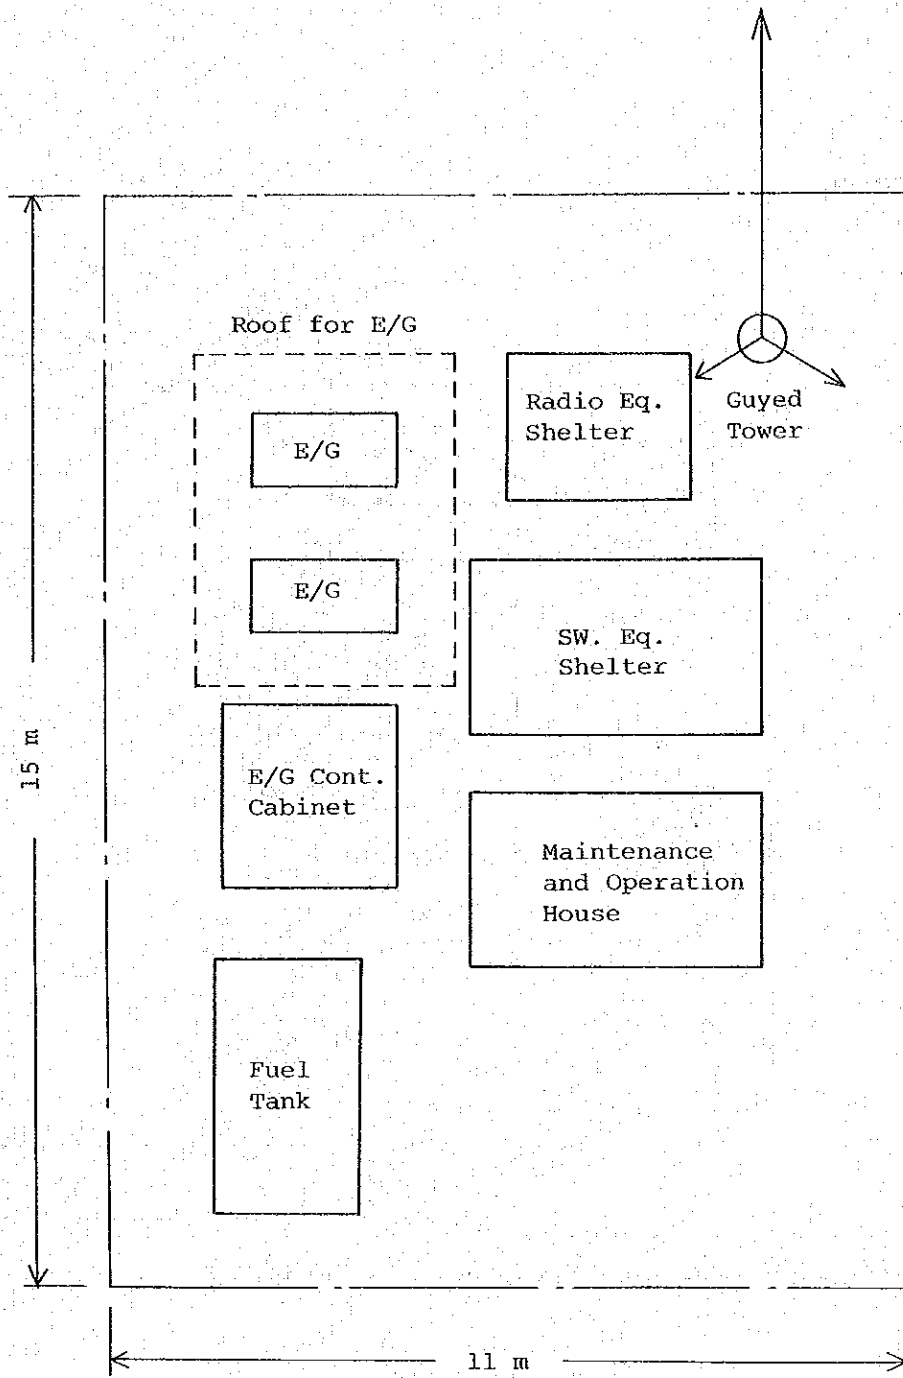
(4/5) Typical Site Layout Plan for Self-Powered Exchange with Guyed Antenna Tower
